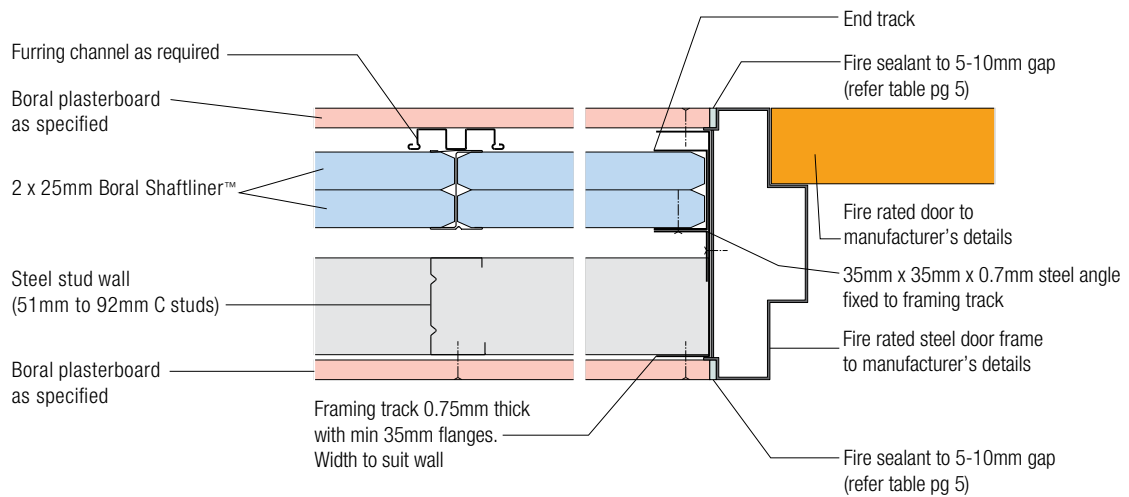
Shaftliner™ Panels to Door Junction Detail 2
